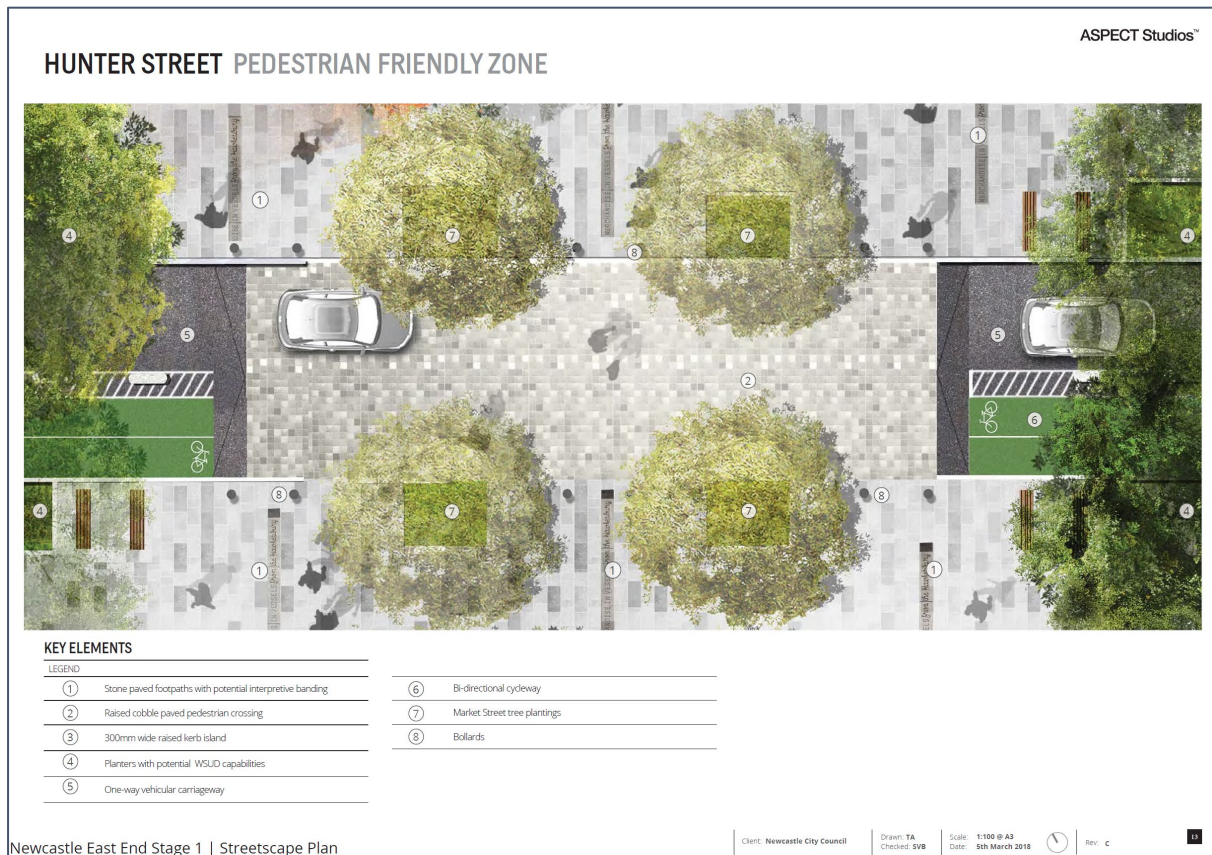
Hunter Street East End streetscape plan (Source: Aspect Studios)
